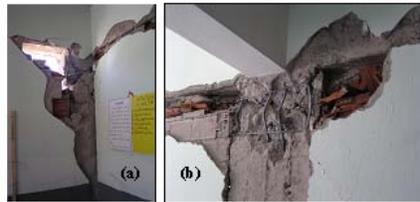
Typical captive column failures observed in (a) exterior and (b) interior columns restrained by full-bay masonry infill walls.
